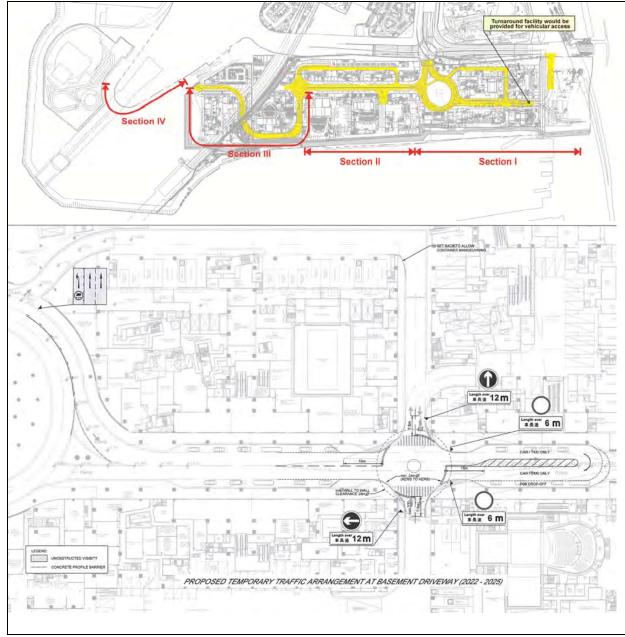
Proposed Arrangement of Basement Driveway Before Canton Road Access in Place
